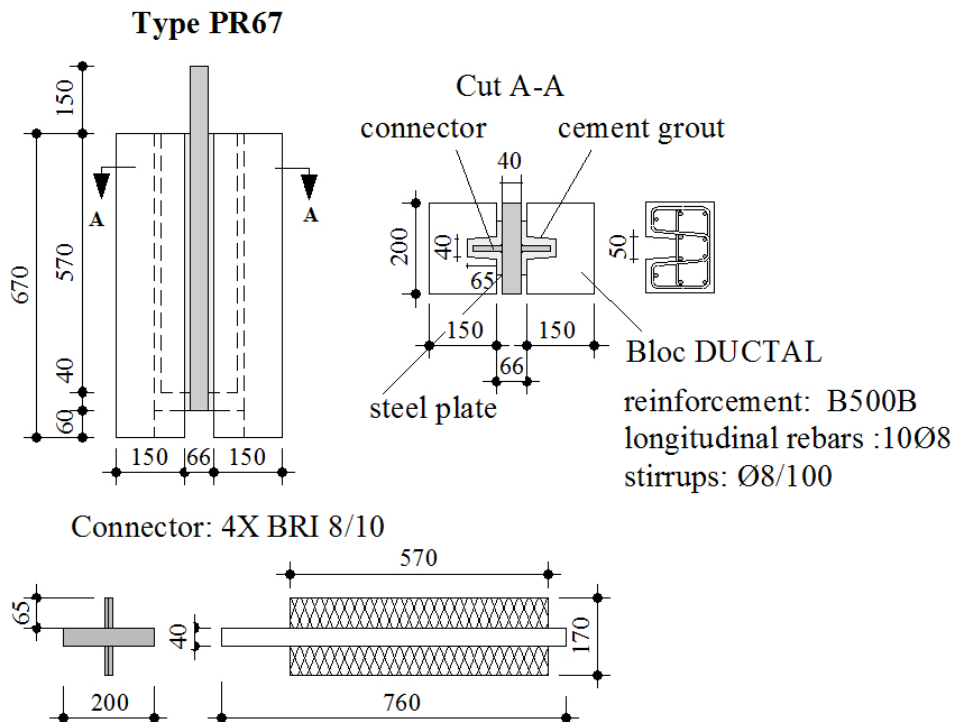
Geometrical characteristics of push-out specimens consisted of blocks of DUCTAL<sup>®</sup> with steel reinforcement, steel connector and cement grout
